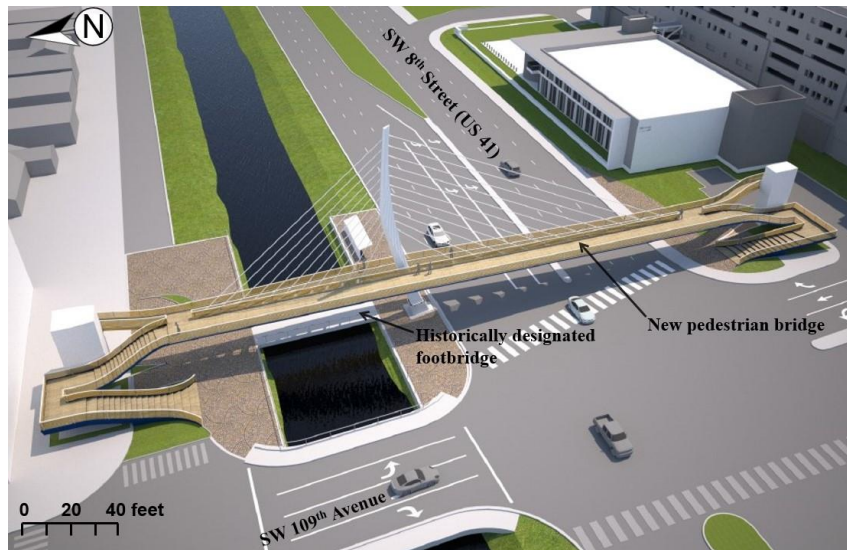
Bridge rendering of what the new signature pedestrian bridge would look like as submitted by FIU as part of the 2013 TIGER grant application (Source: FIU modified)
